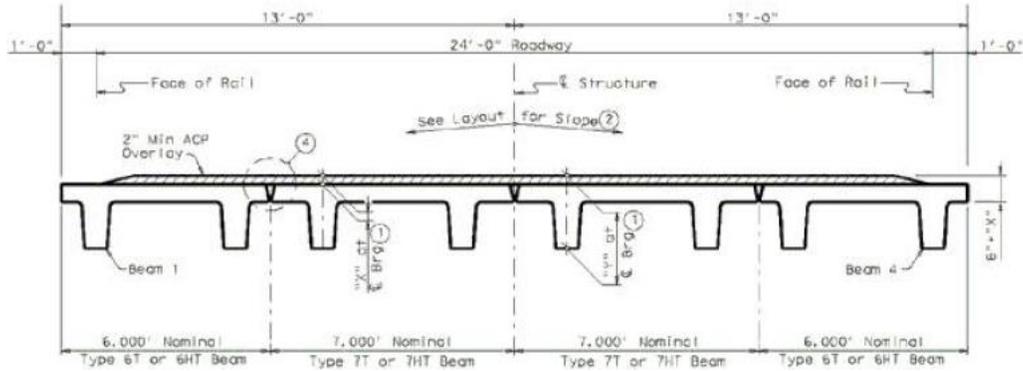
Double-tee Bridge Profile Typical Transverse Section [9].
